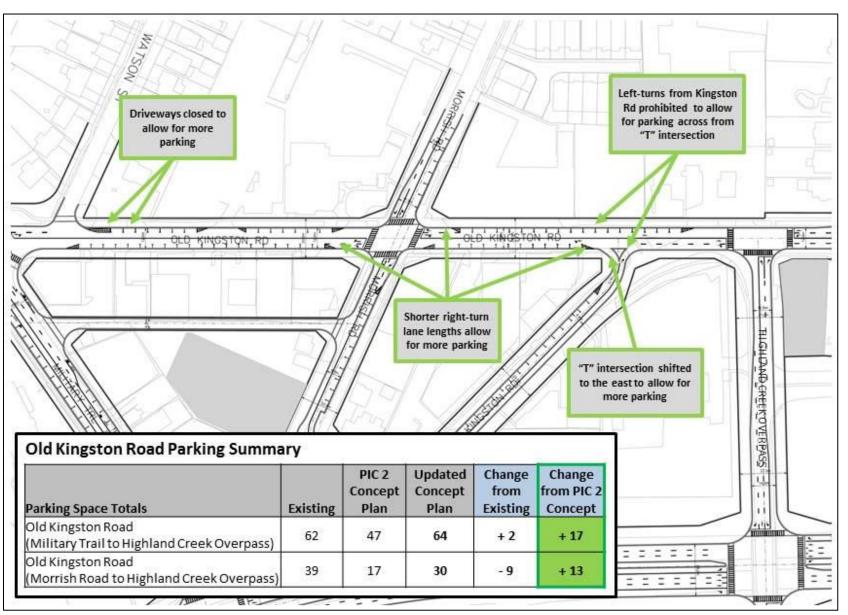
Proposed Long-Term Parking Plan for Old Kingston Road
